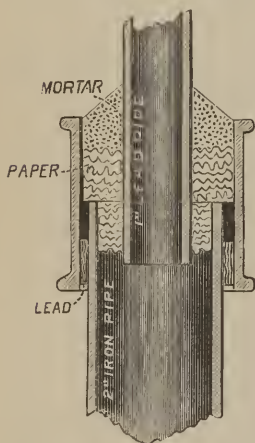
Specimen of plumbing taken from one of a block of houses building in New York in December, 1882, ("Sanitary Engineer.")
